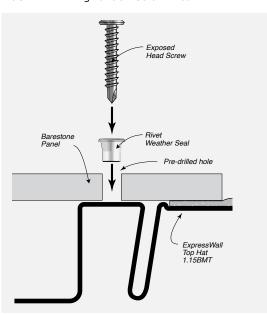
Horizontal Joint Fixing – Sealed Option
